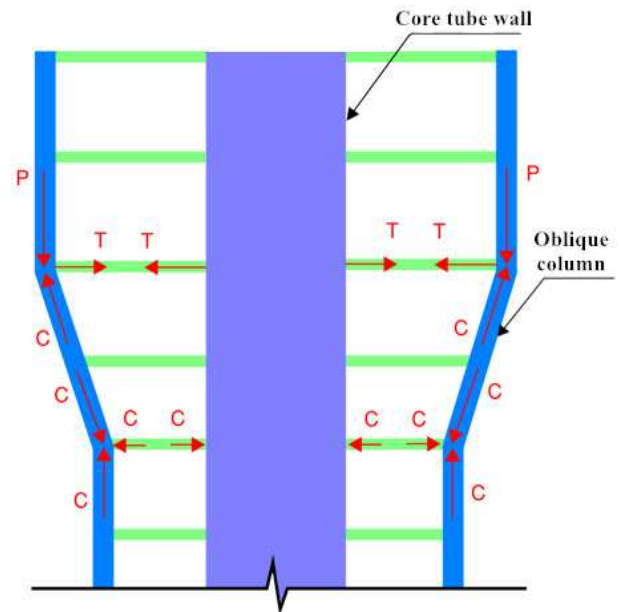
Horizontal force transmission under gravity load of frame-core wall structure with inclined column.
